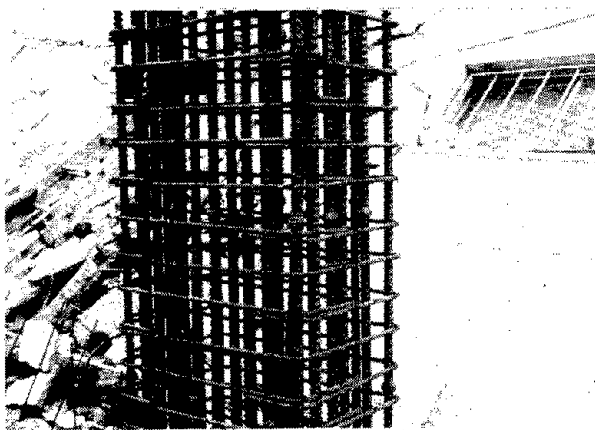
Transverse reinforcement in a new reinforced concrete column
